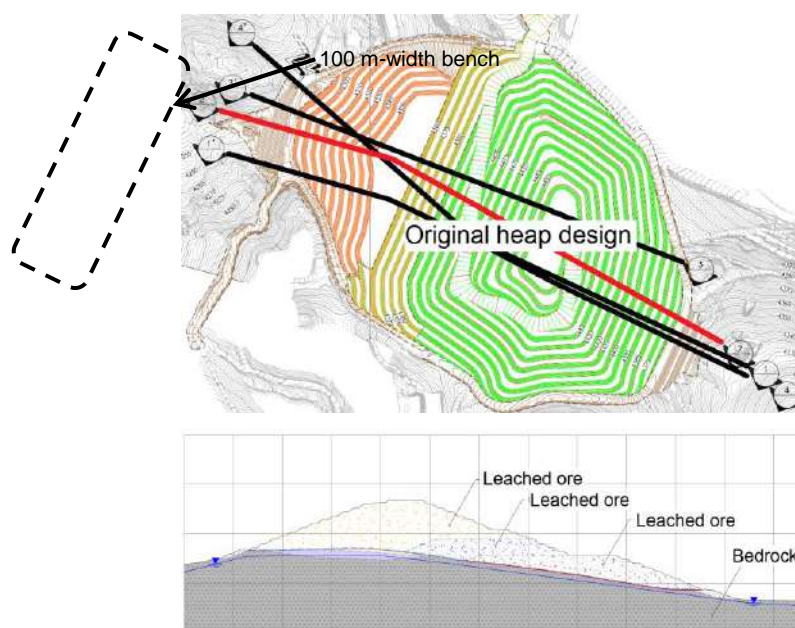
Plan view of the original design of the leach pad and heap critical cross-section
